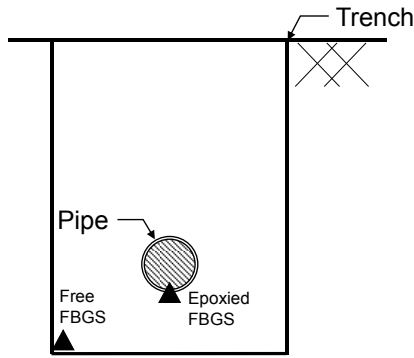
Cross section through the leak location showing the FBGS layout at section A-A
